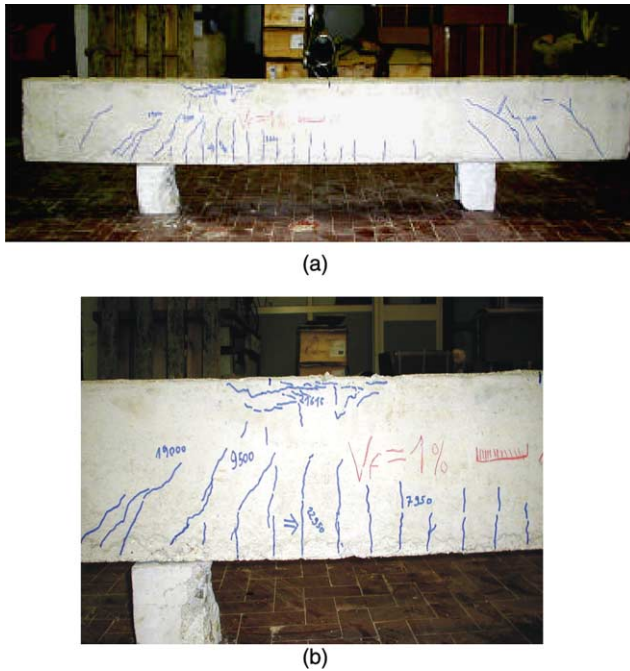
Flexural failure of beam A12: (a) general view; (b) detail.
